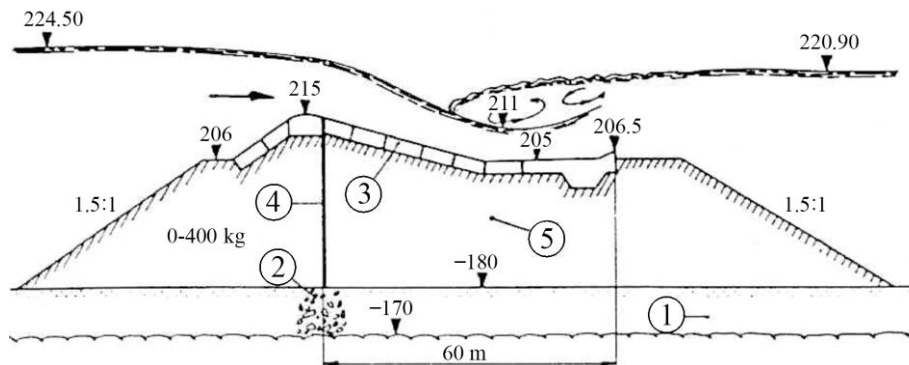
Protection of Cabora Bassa cofferdam with concrete slabs 3 m thick and size of $7 \times 7 \text{ m}^2$ with ① alluvial river bed, ② grouting ③ concrete slabs, ④ sheet pile ⑤ riprap (GT-CFGB 1973).
